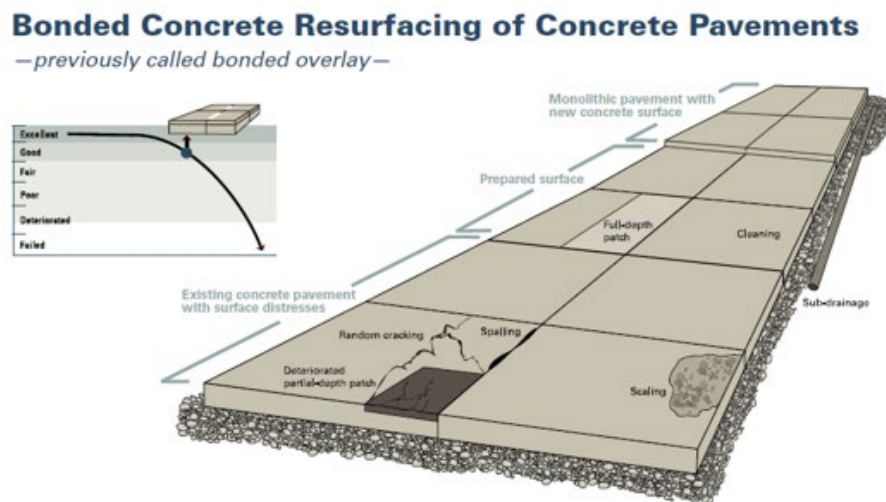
Bonded Concrete Resurfacing of Good Condition Concrete Pavement (Harrington et al., 2007)
